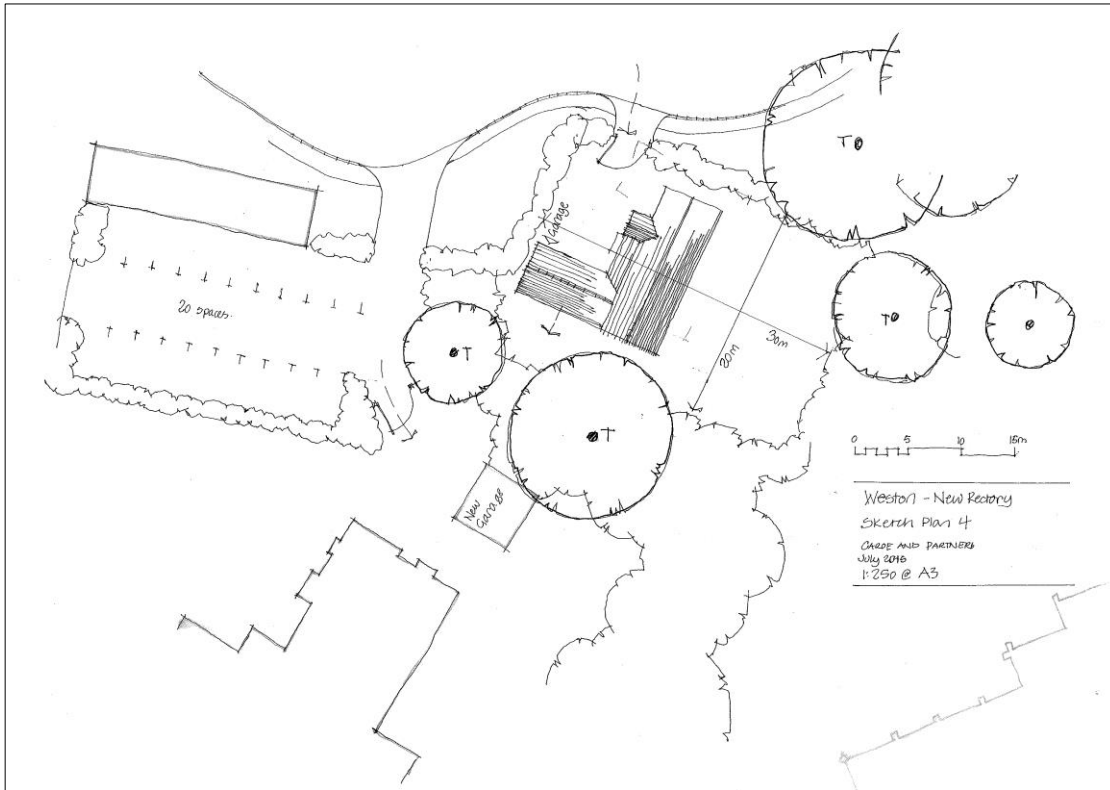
Proposed Site Plan Number 4 © Henry Adams LLP
